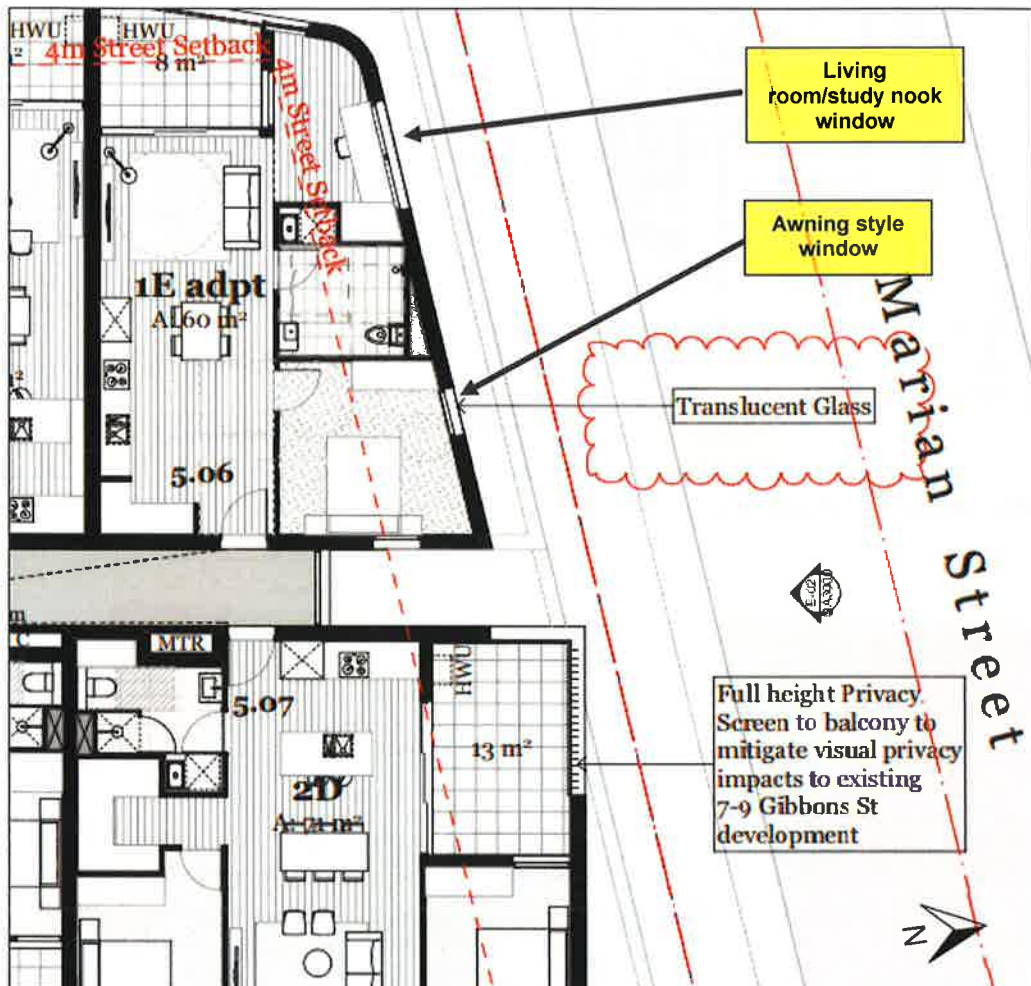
| Proposed privacy mitigation measures for north facing apartments (Base source: Architectural Plans)
